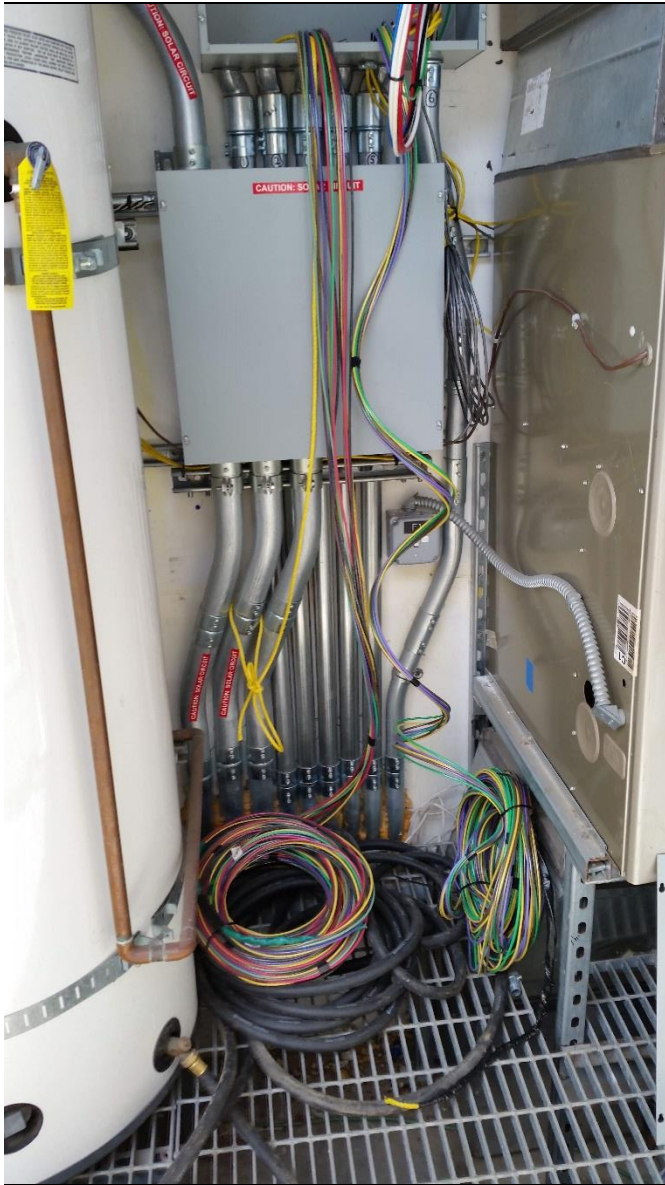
Wire pulled from turbines/sensors to mechanical closet.
